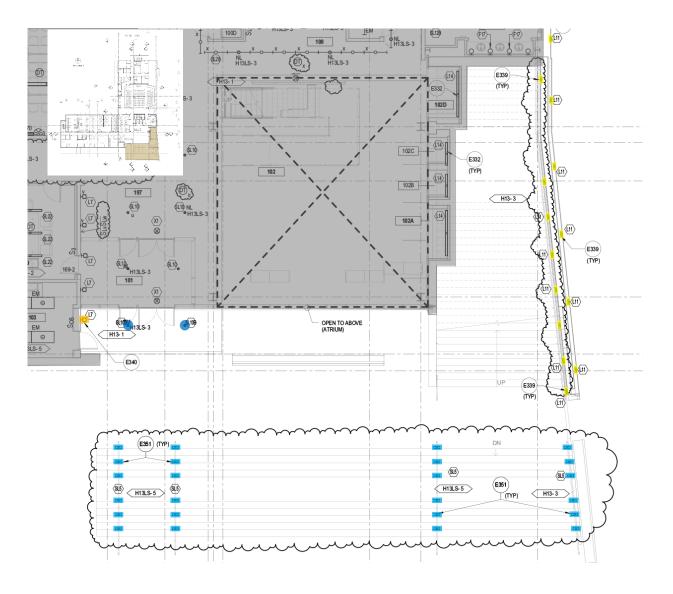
| plan showing the existing lighting for the outdoor stair (colors match fixture schedule)
